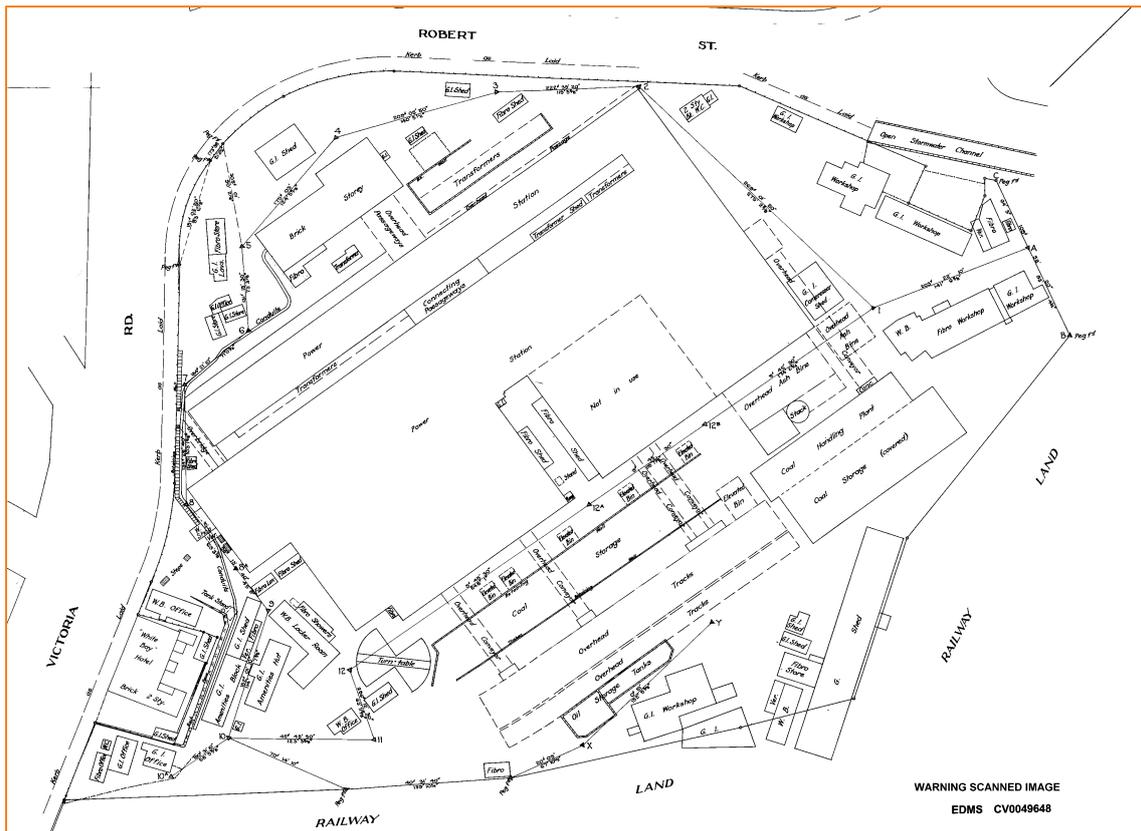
‘Department of Railways NSW, White Bay Power Station, Detail Survey’, dated July 1953. Source: Transport for NSW Plan Room, 0049648
